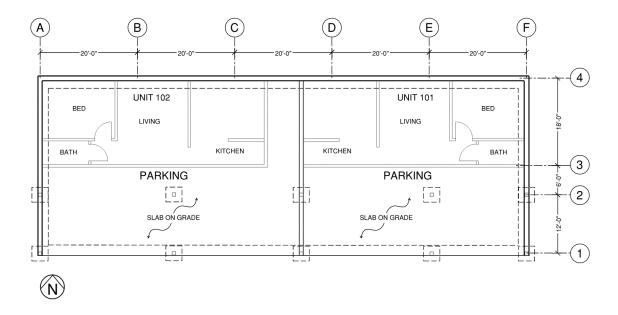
First story of the long-side-open archetype floor. A large portion of the first story is occupied.
